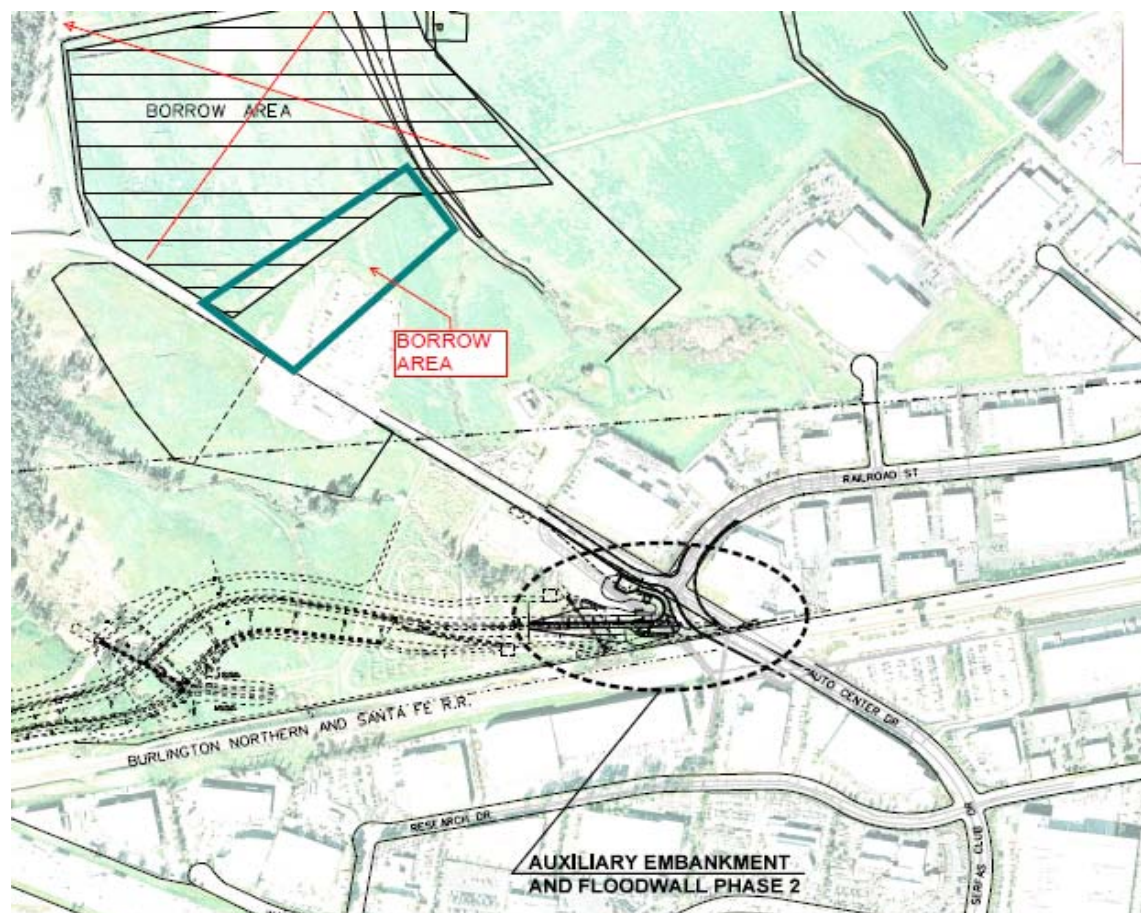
Auxiliary Embankment and Floodwall, Phase 2 Project Location
